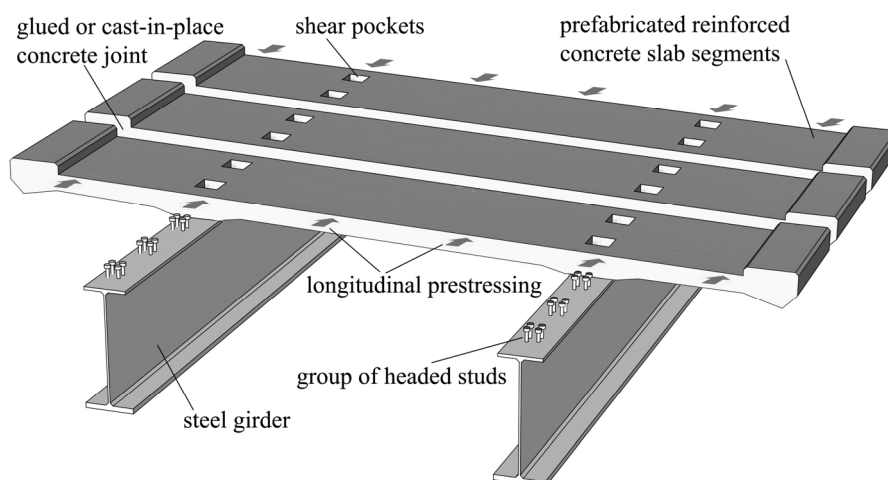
Composite bridge with prefabricated deck and shear pockets [Lebet and Hirt 2009]
